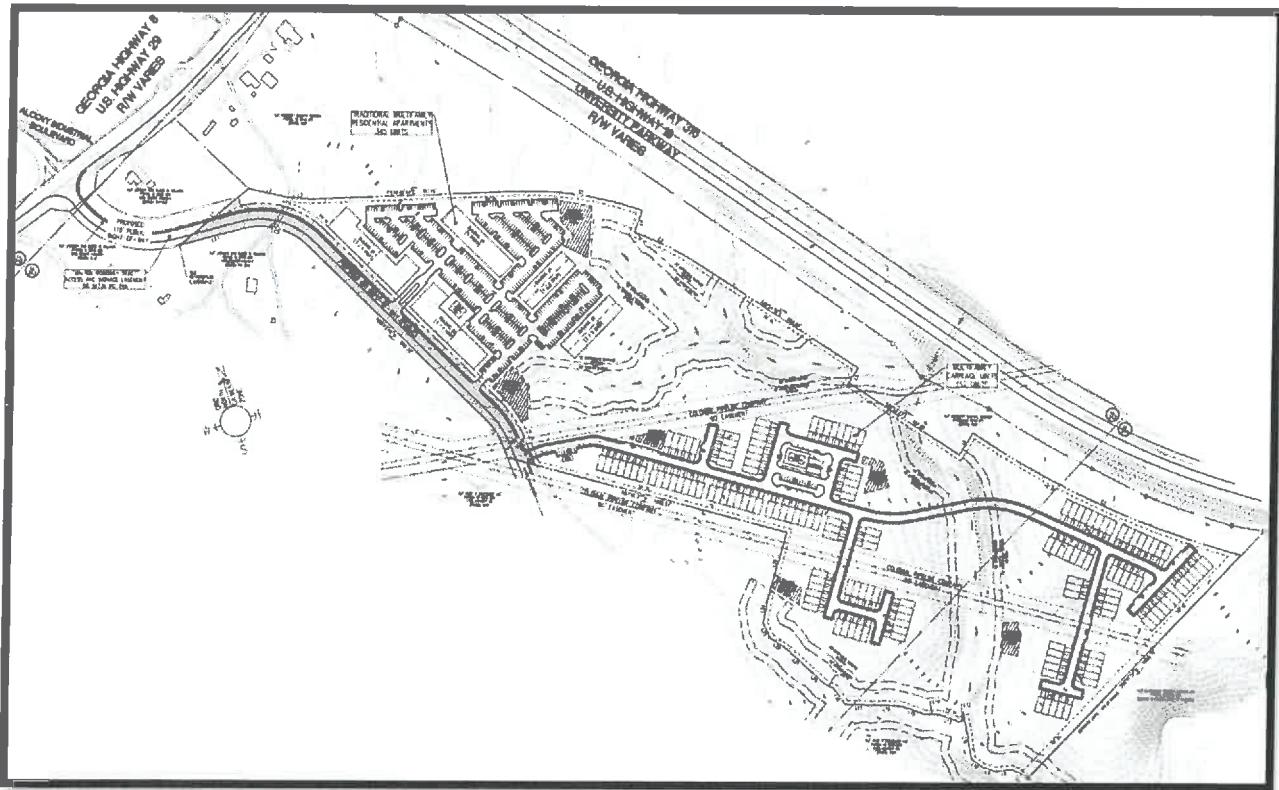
Site Plan for Proposed Sugarloaf Crossing Subdivision
